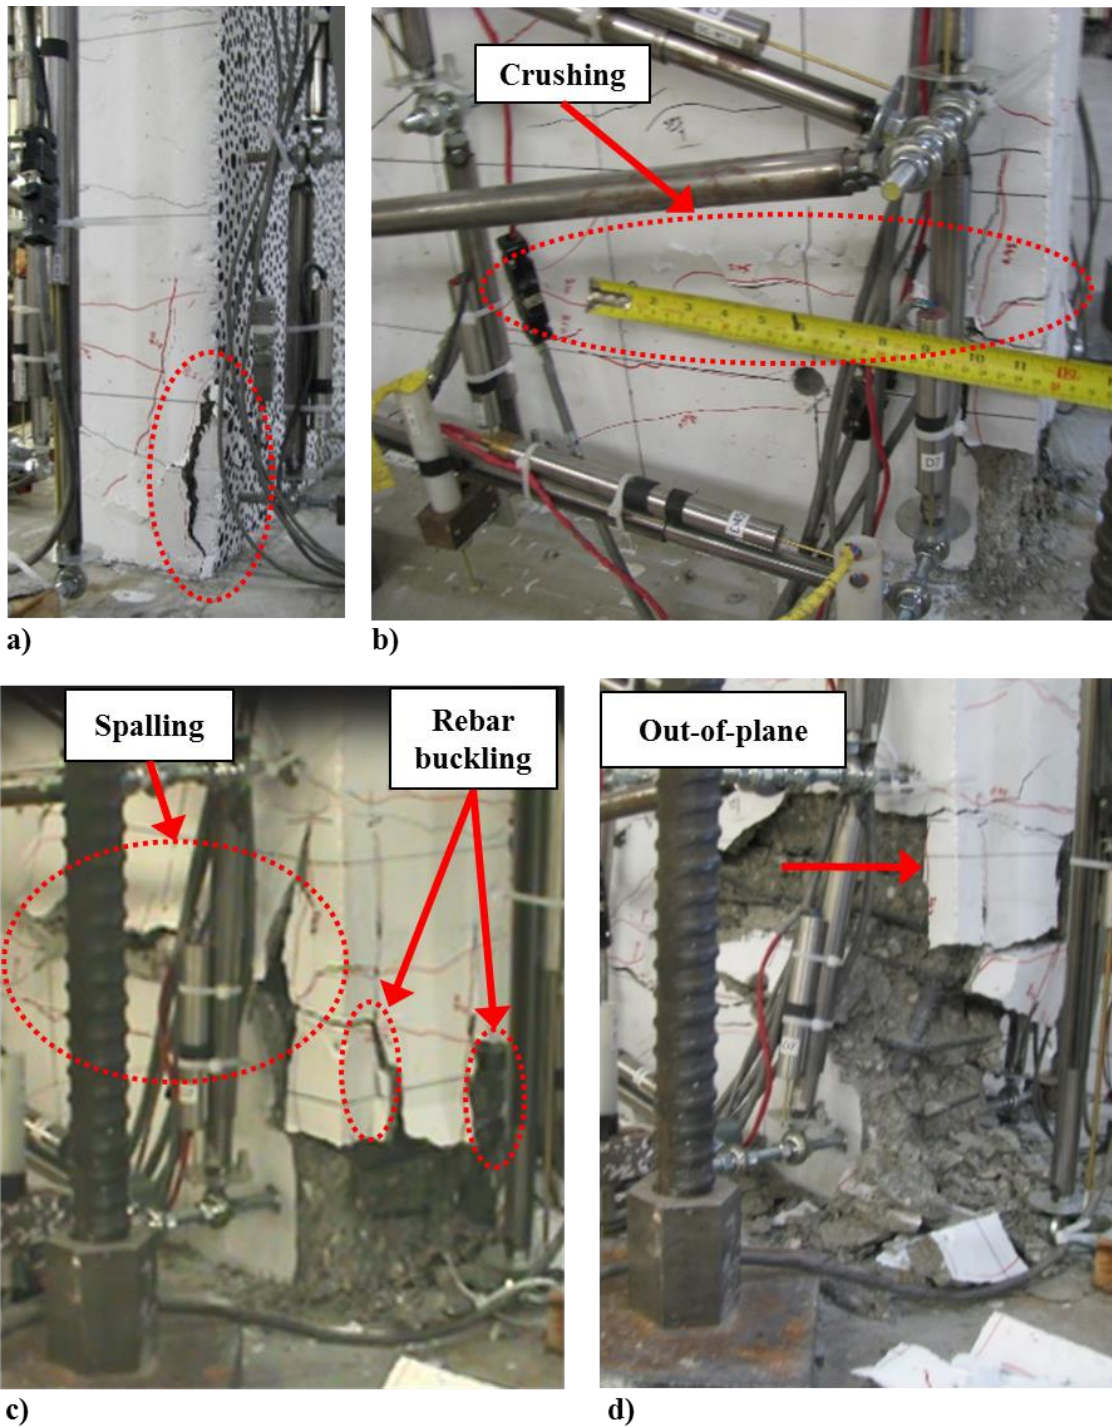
Specimen WP1 west boundary damage – a) Vertical splitting and spalling of cover concrete (+0.50% rotation, cycle 3); b) Cover concrete crushing on rear (north) face (+1.0% rotation, cycle 1); c) Cover concrete spalling and buckling of longitudinal reinforcement (+1.5% rotation, cycle 1); and d) Out-of-plane instability
